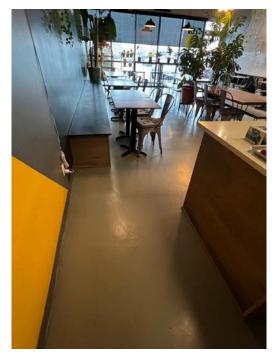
Floor Slab in Front of Former Harbour Pointe Cleaners, Facing Northwest (Suite B6) (November 14, 2024)
